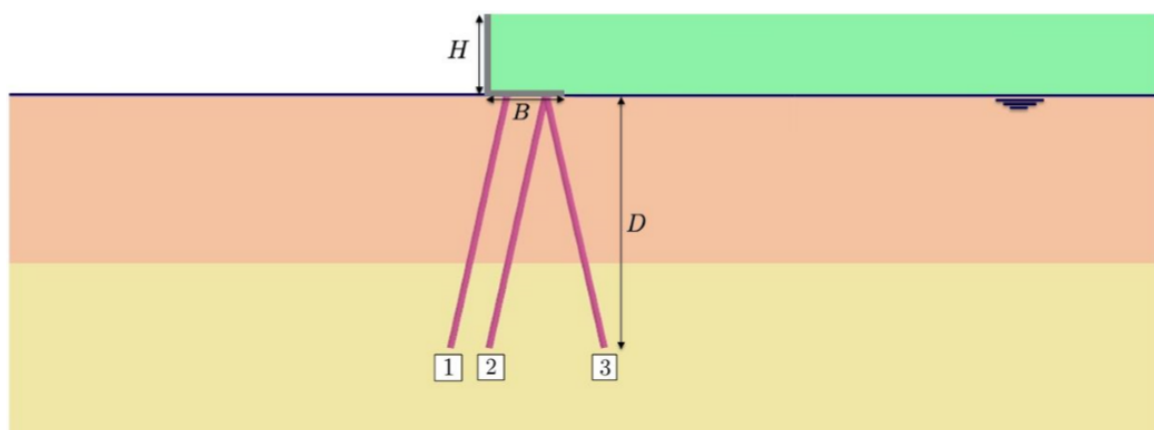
Geometry: Cantilever Retaining wall on piles
